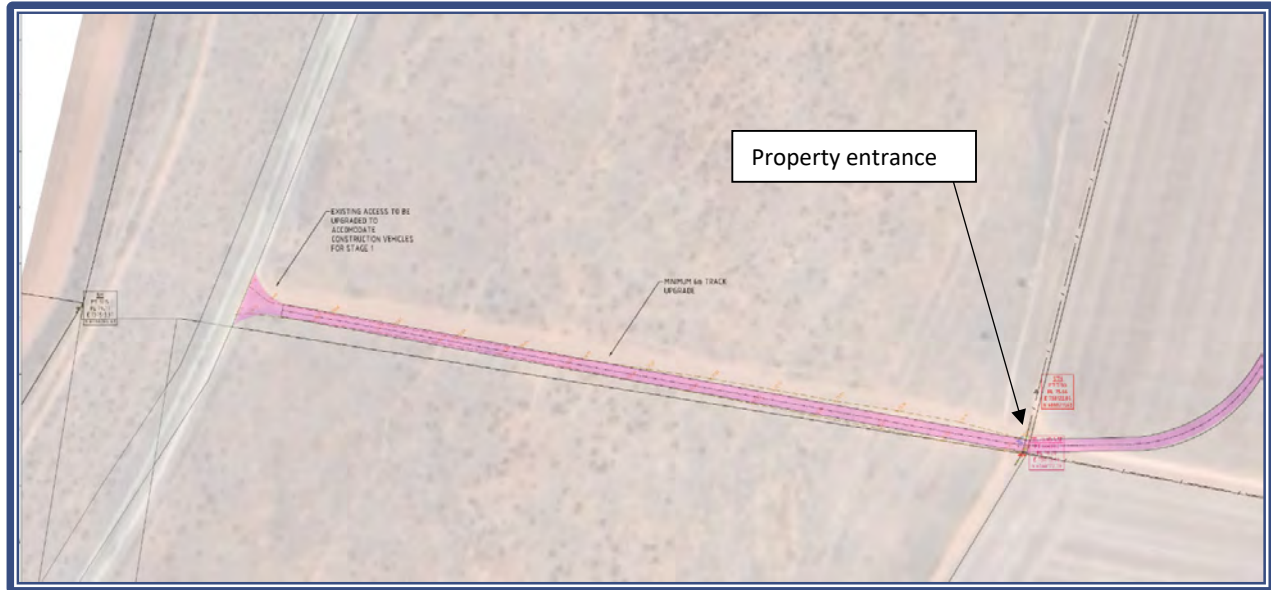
Plan identifying the project site access (Source: Price Merrett plans – Sheet 12)
